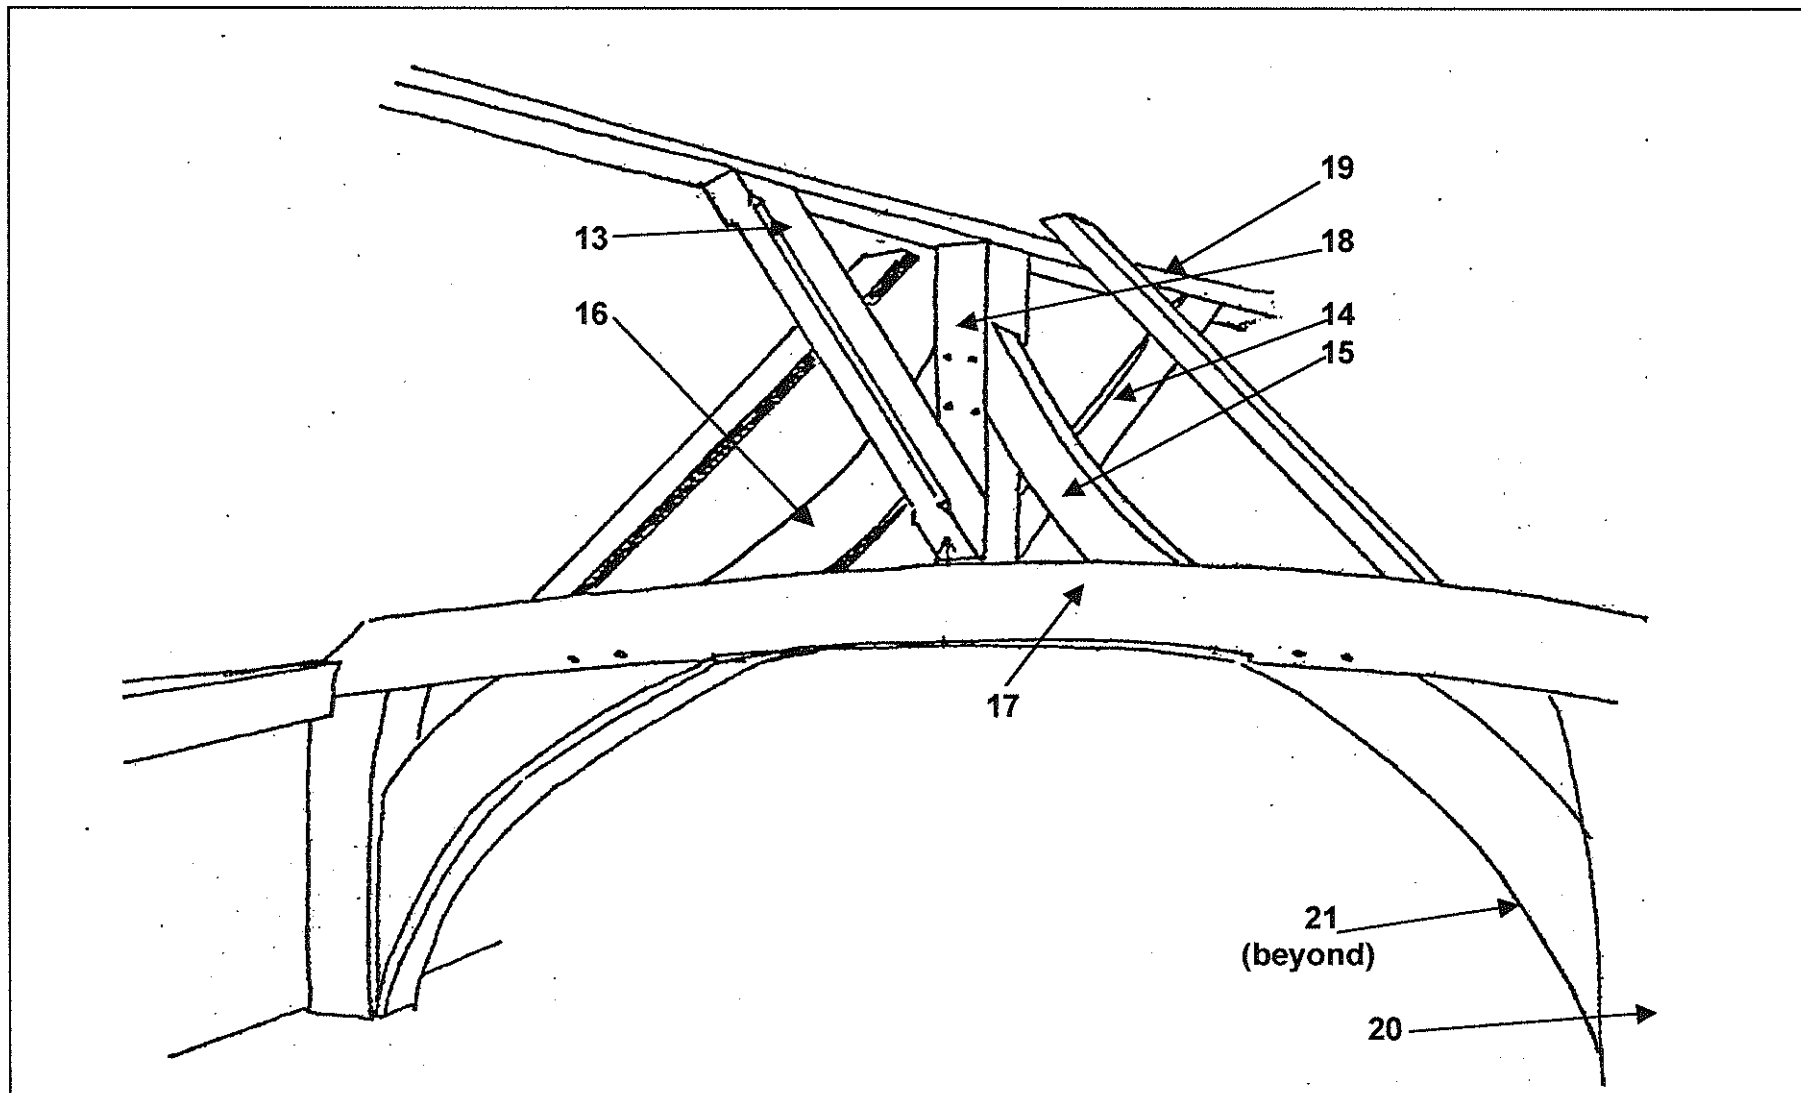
Drawing of truss 2 (central truss) of the east cross-wing to show sample positions
